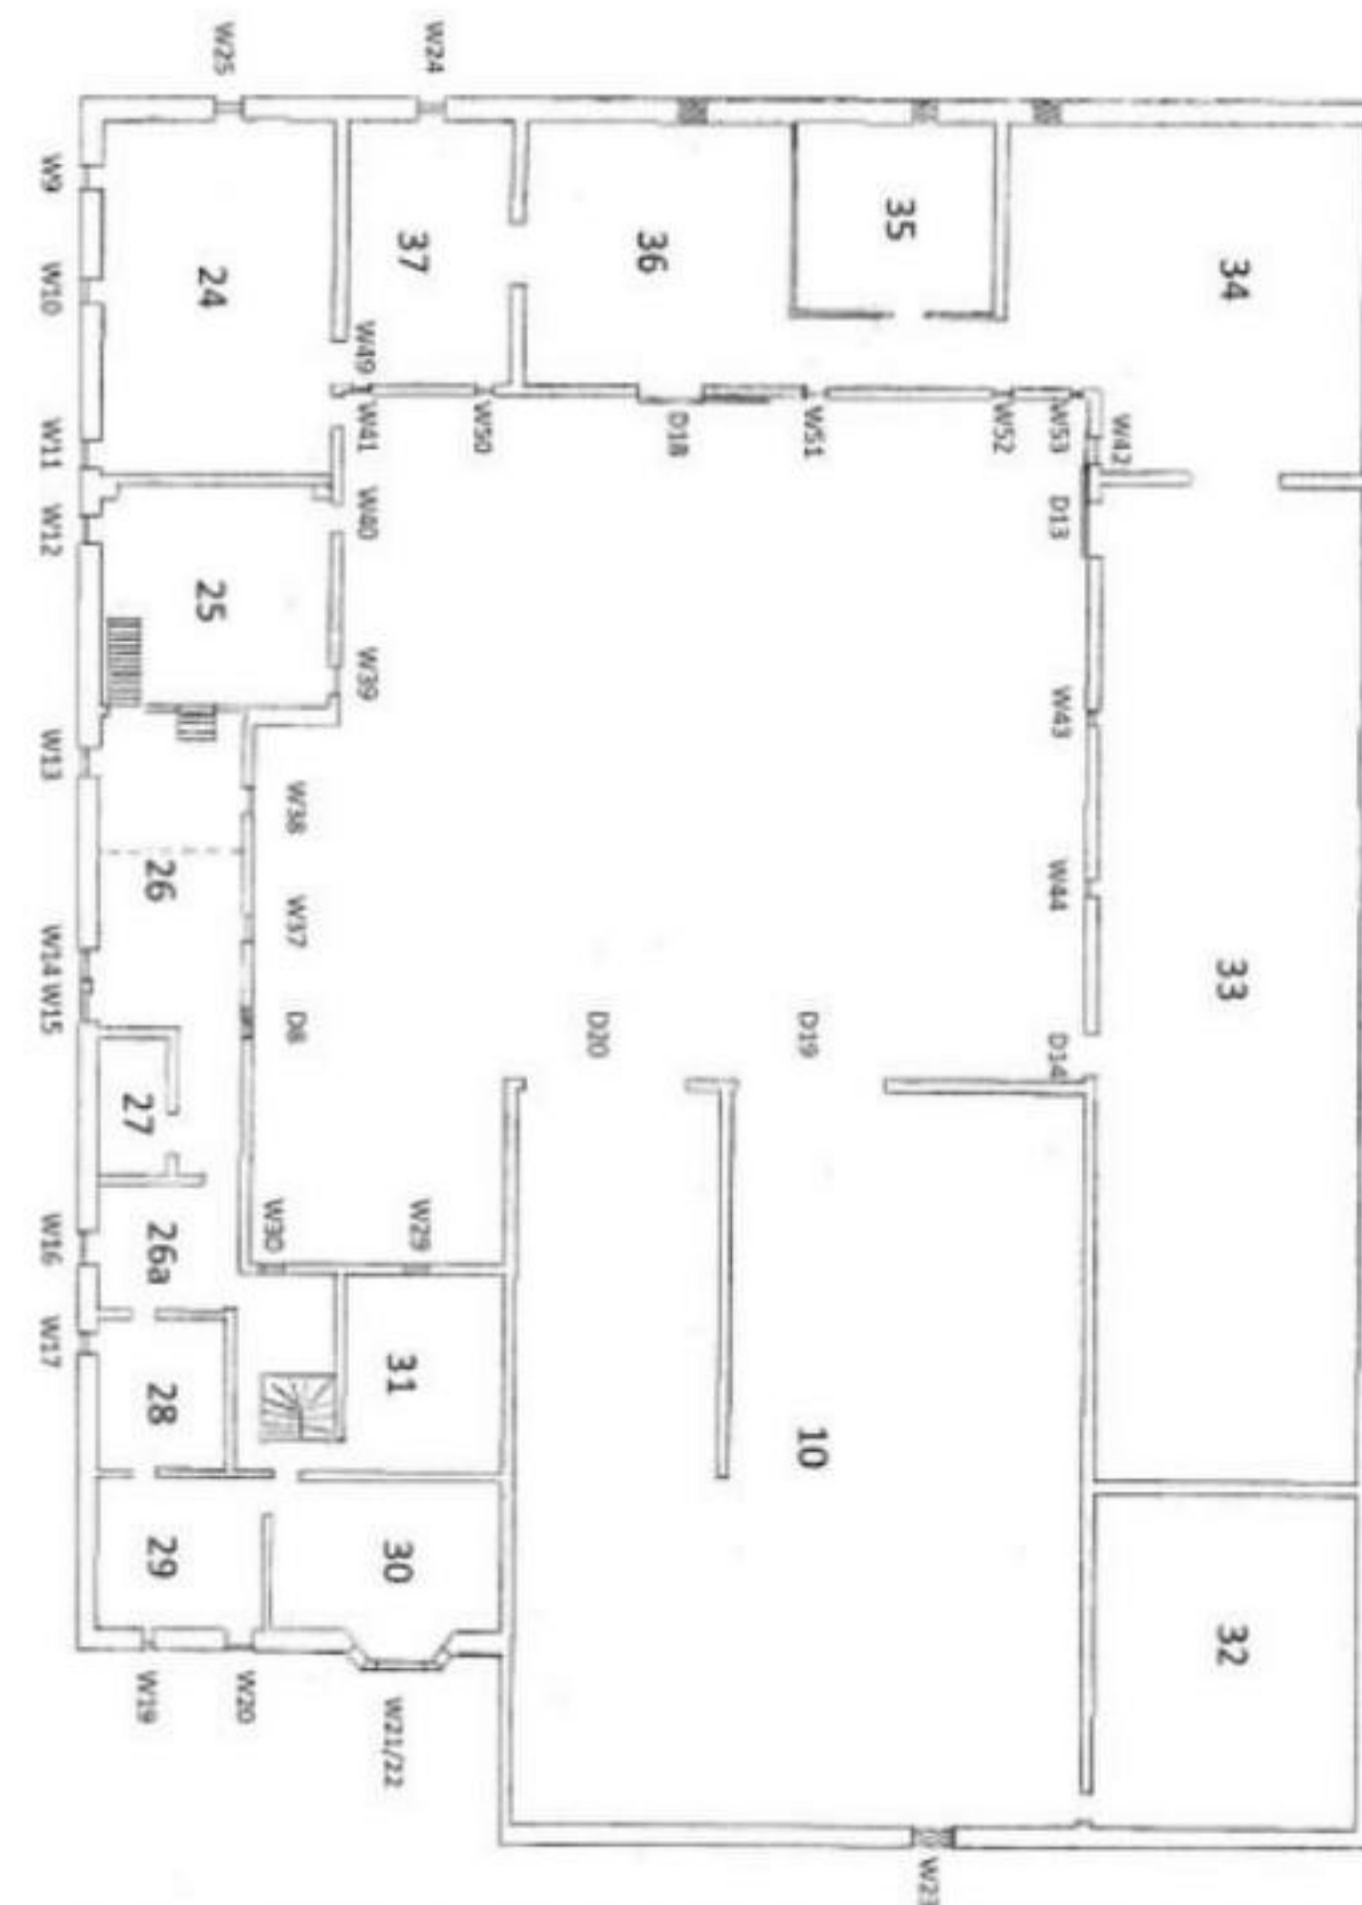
Existing First Floor Plan (courtesy of Robert Lenfert Archaeology)
